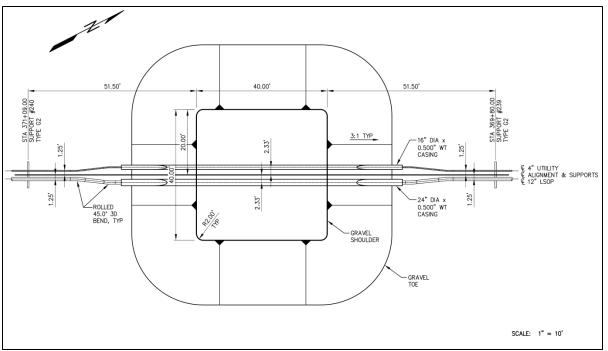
Badami Ice Road Crossing Pad, Plan View
